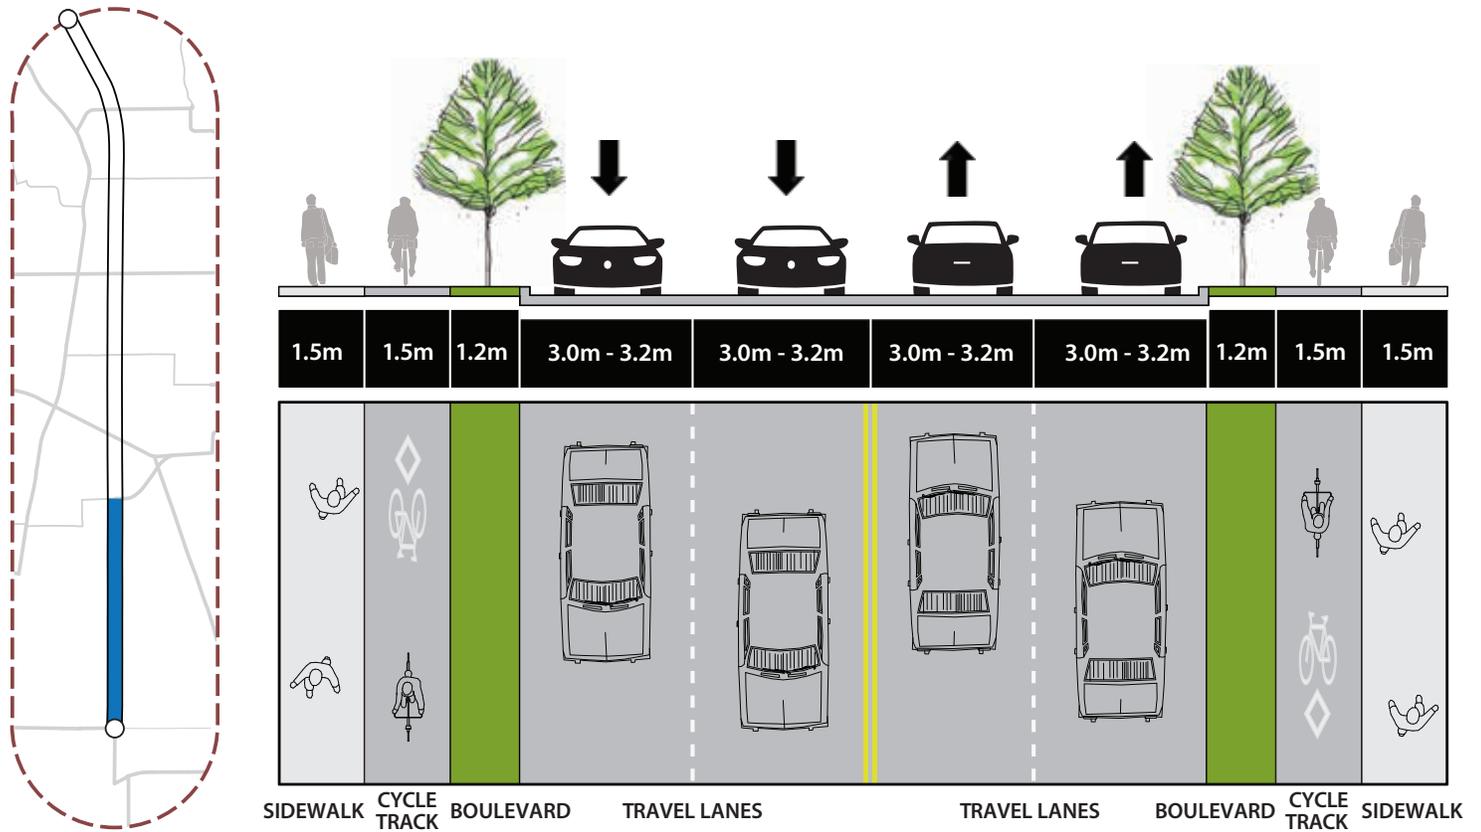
| Conceptual Shelbourne Street cross section, North Dairy Road to Pear Street
